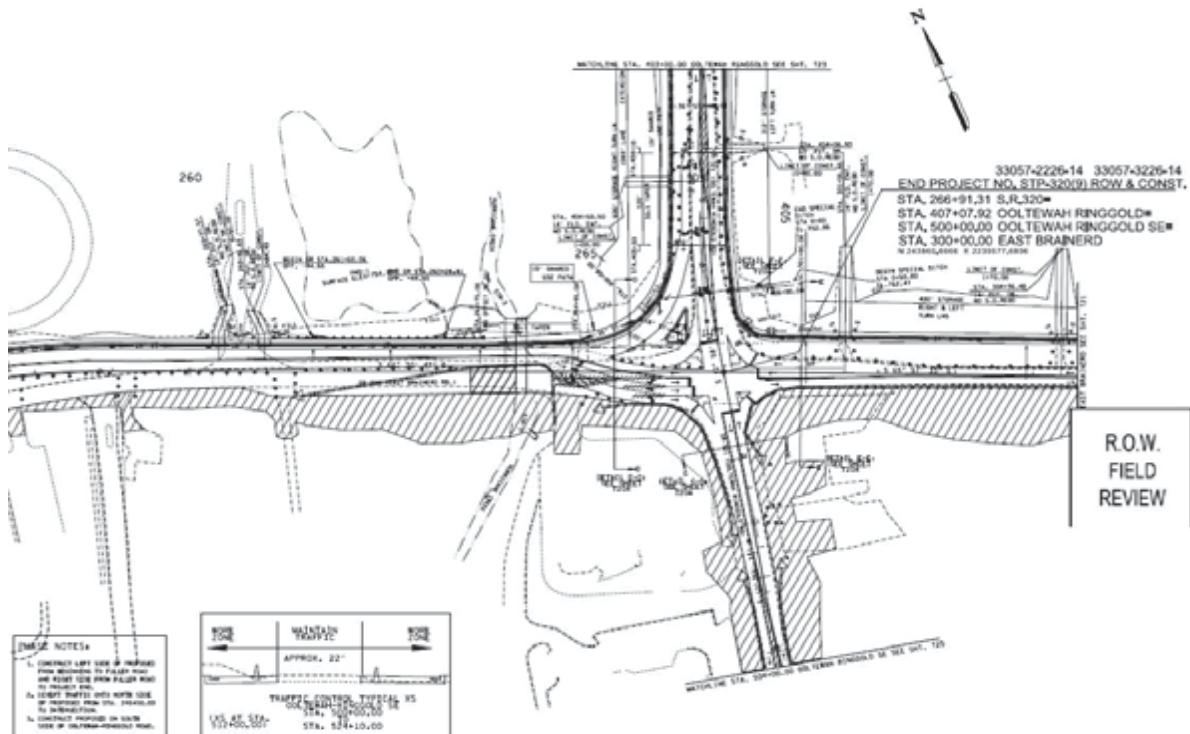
Traffic control diagram of construction zone on the south side of SR-321 during Phase 2 (05/12/2020 ROW Field Review Plans, Sheet T20)
